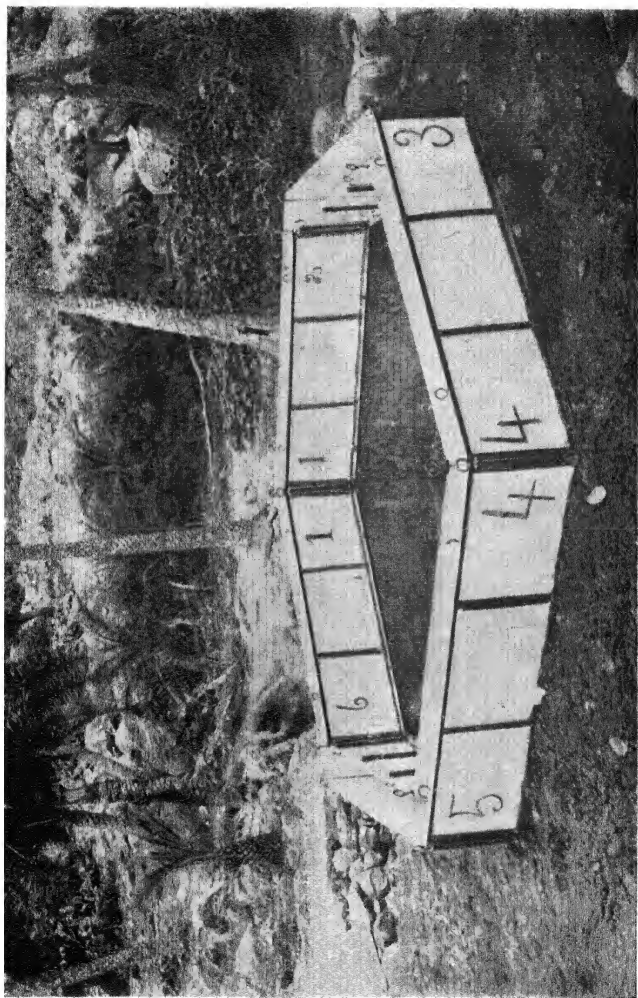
An hexagonal mould in position for laying the Cement Concrete lining.
